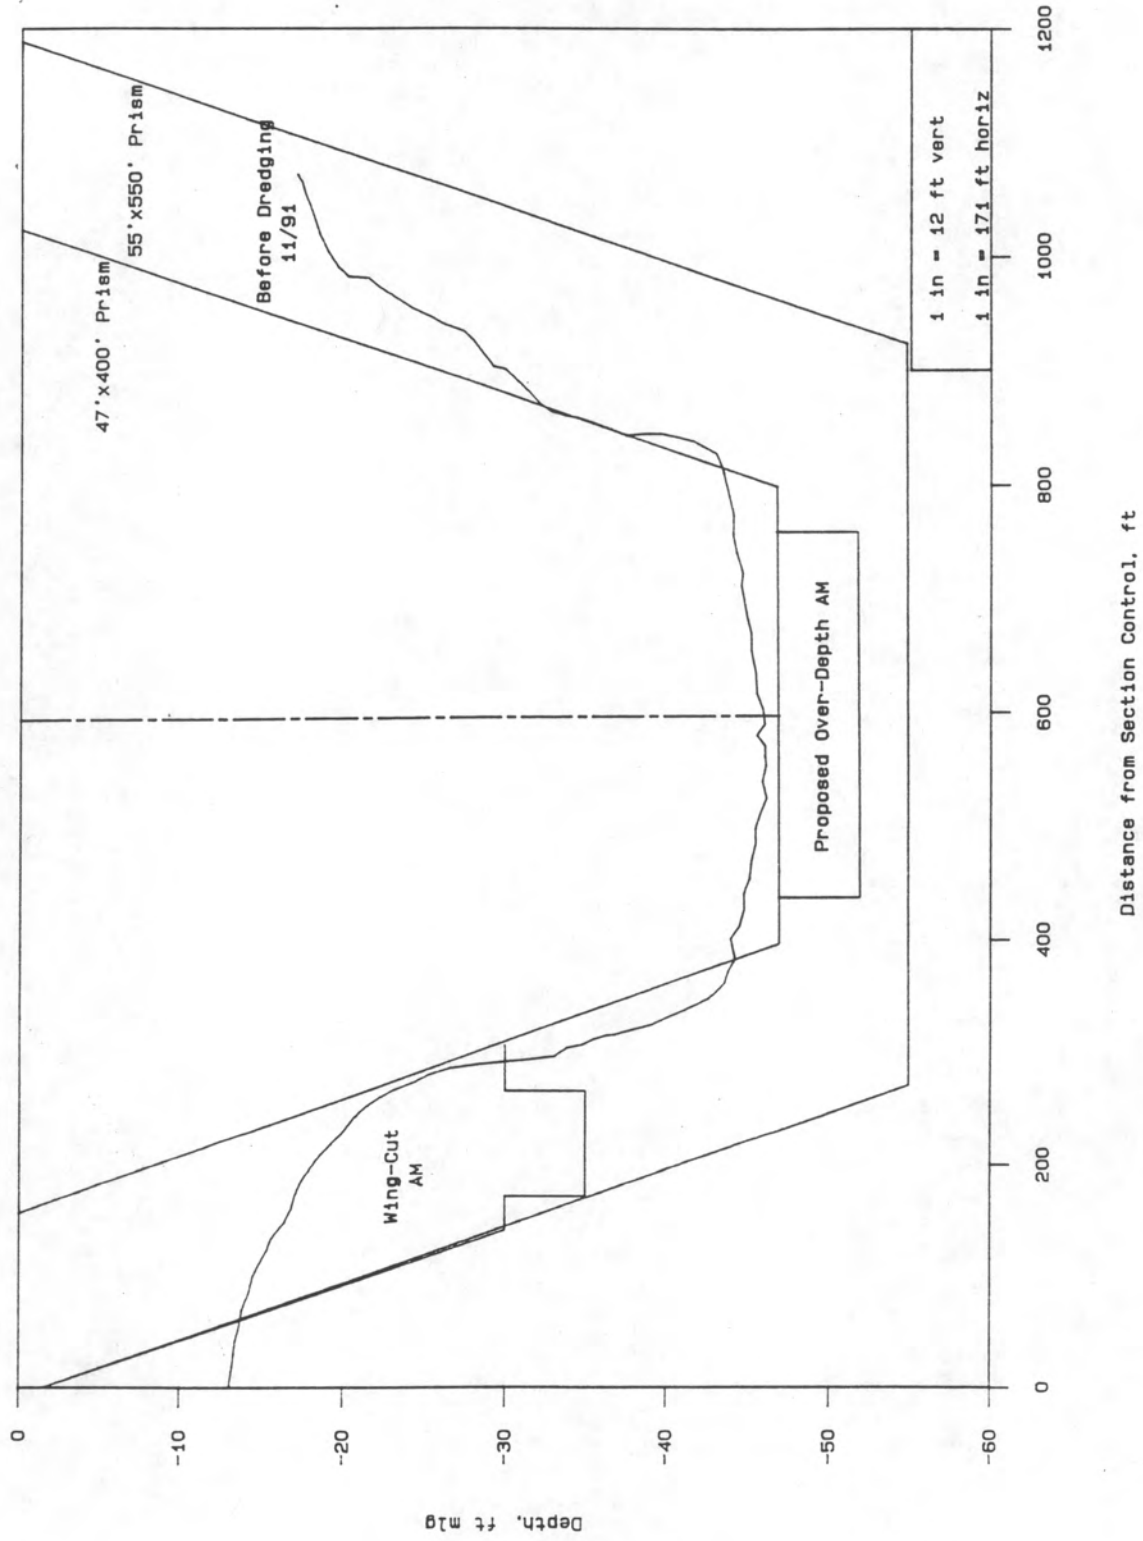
Typical section of the proposed test reach between Stations 880+00 and 935+00
